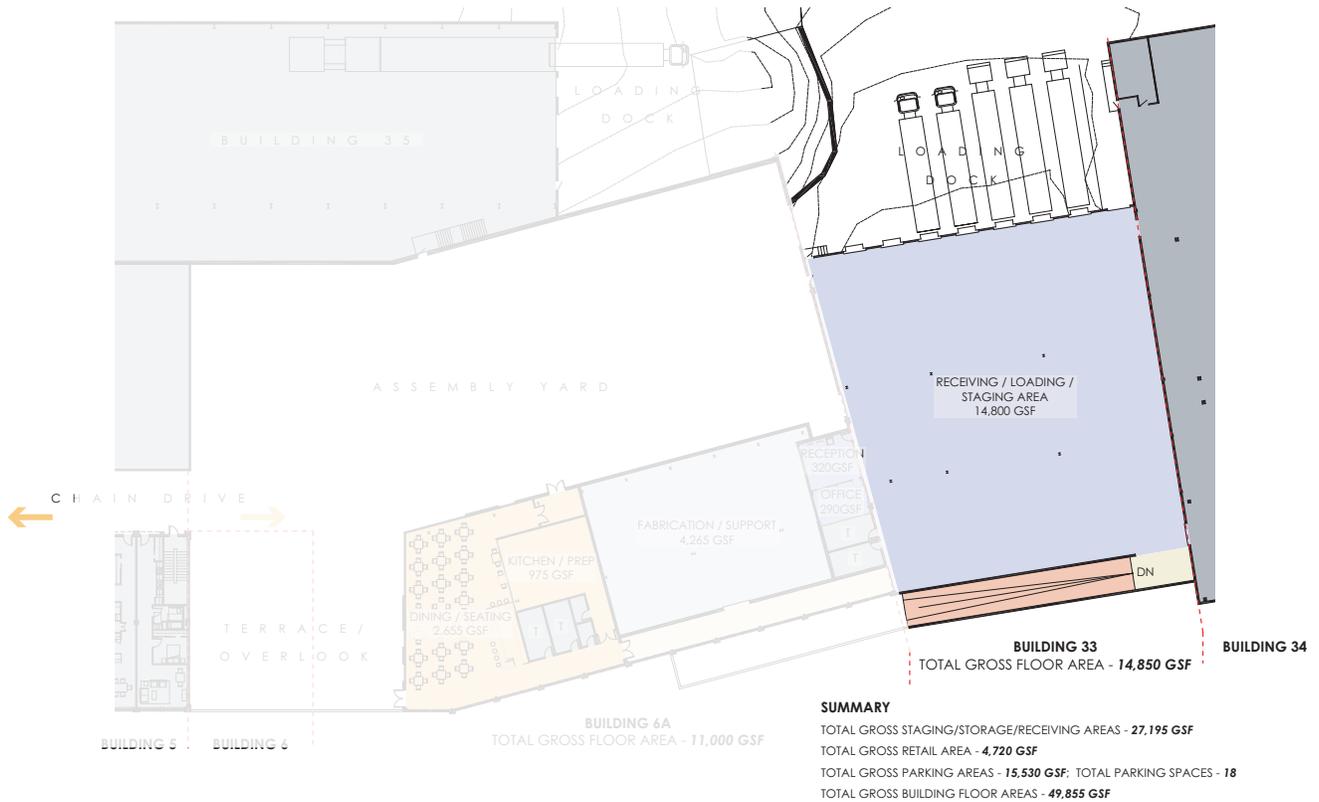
Building 33 - Potential Floor Plan (CJS)
